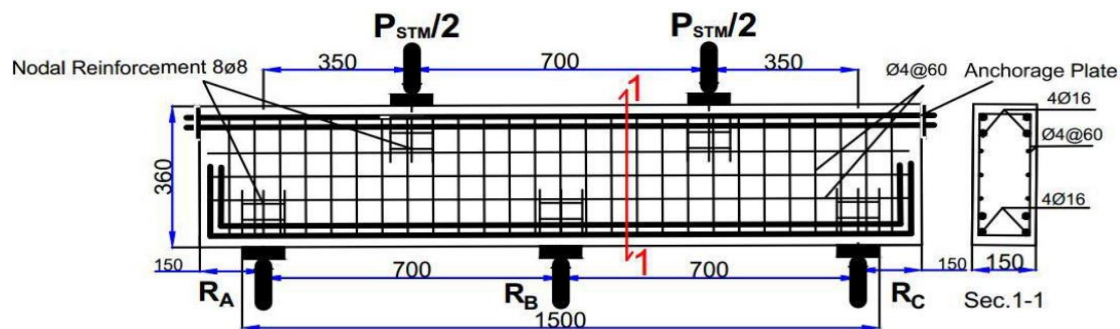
Two-span continuous deep beam specimen (all dimensions in mm) [20]
